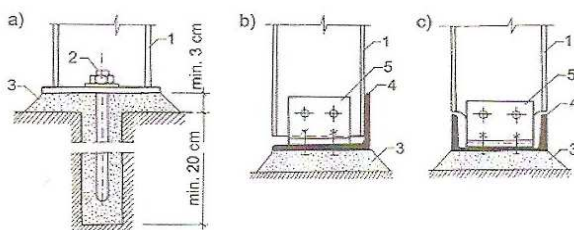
Base of secondary columns: 1- column, 2- anchor bolt, 3- base mortar, 4- ground beam, 5- base angle
